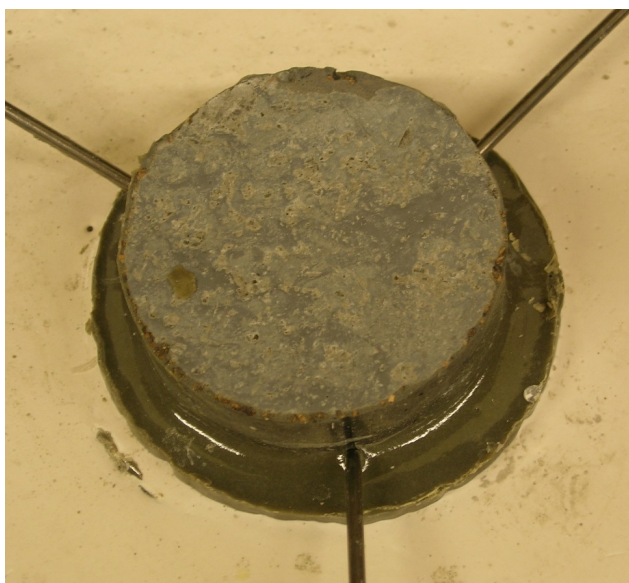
Tension Failure Surface Showing U90WB Primer with no Concrete Adhering.
